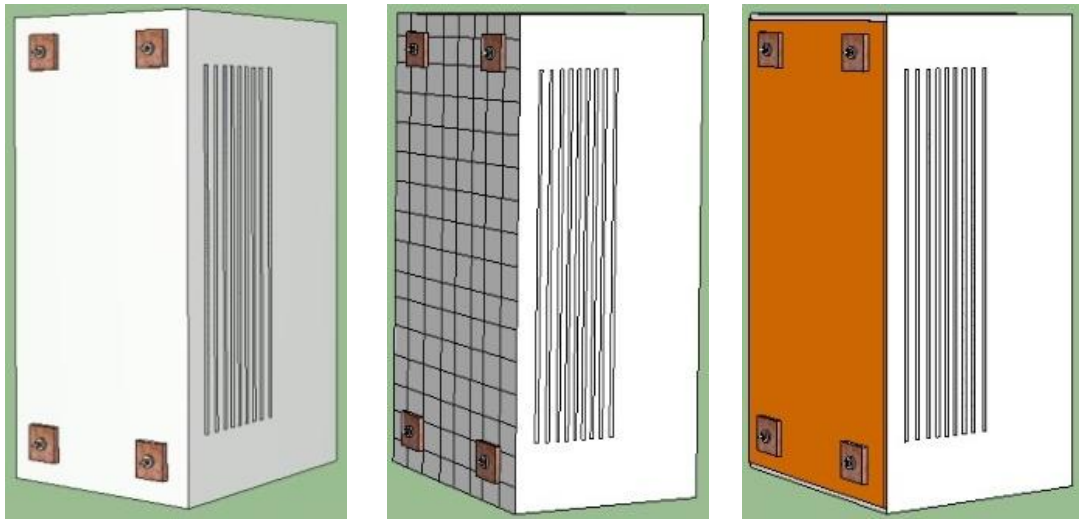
Loading of the concrete specimen reinforced with polymer sheet showing dilation of the concrete prisms (Nemcik *et al.* 2013b)
